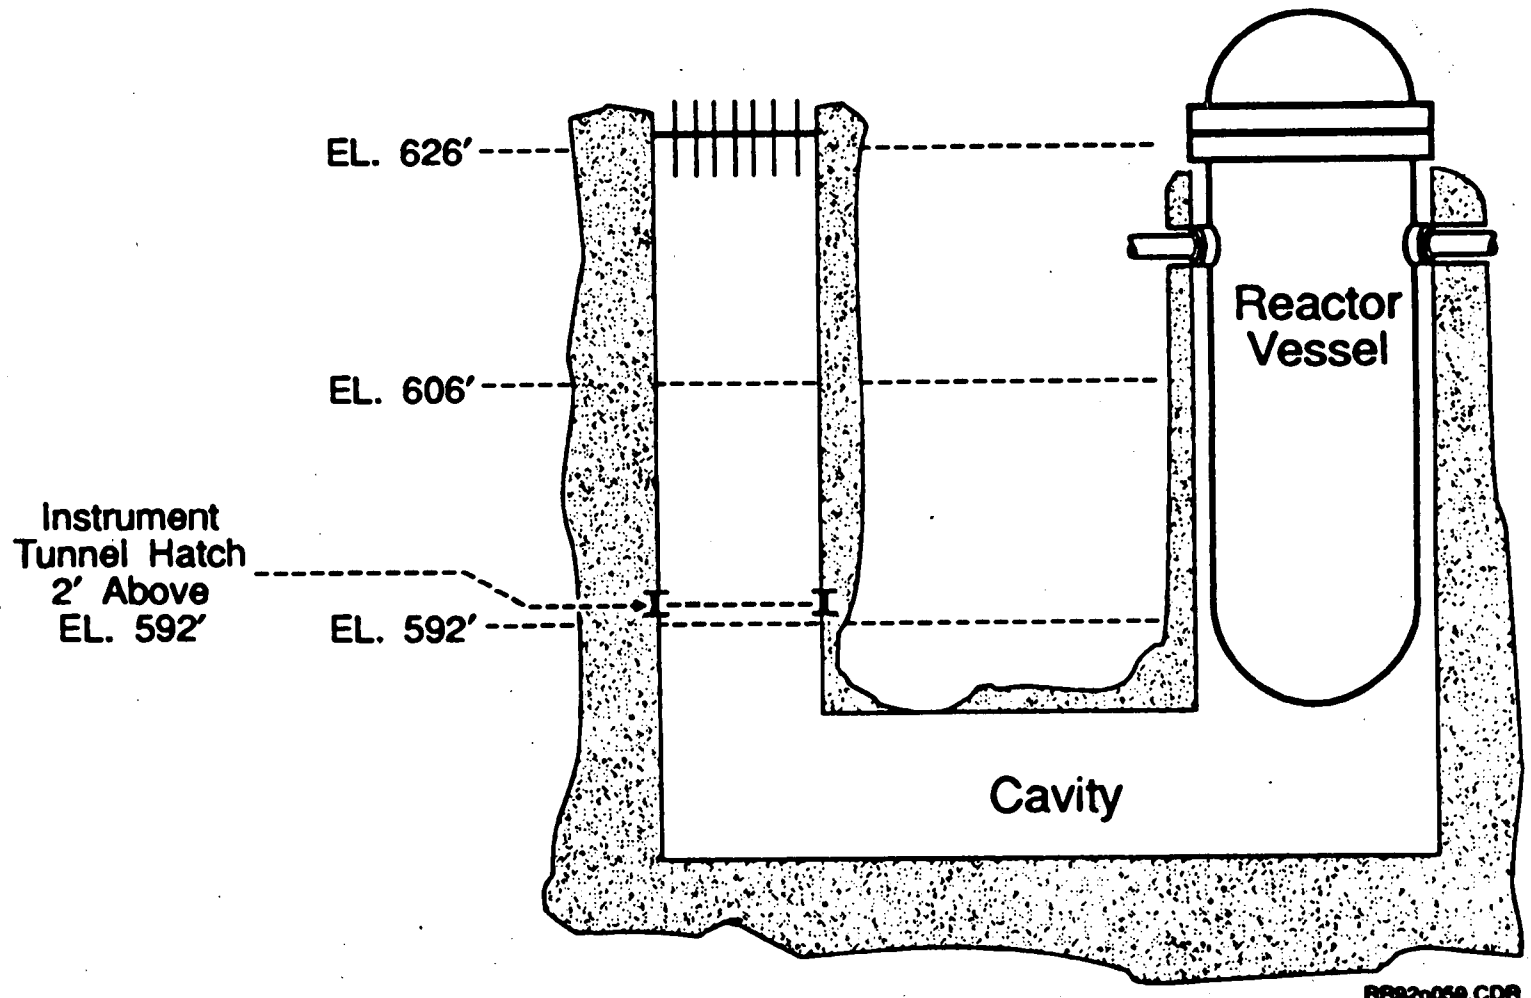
Sketch of the Kewaunee cavity and Instrument Tunnel
